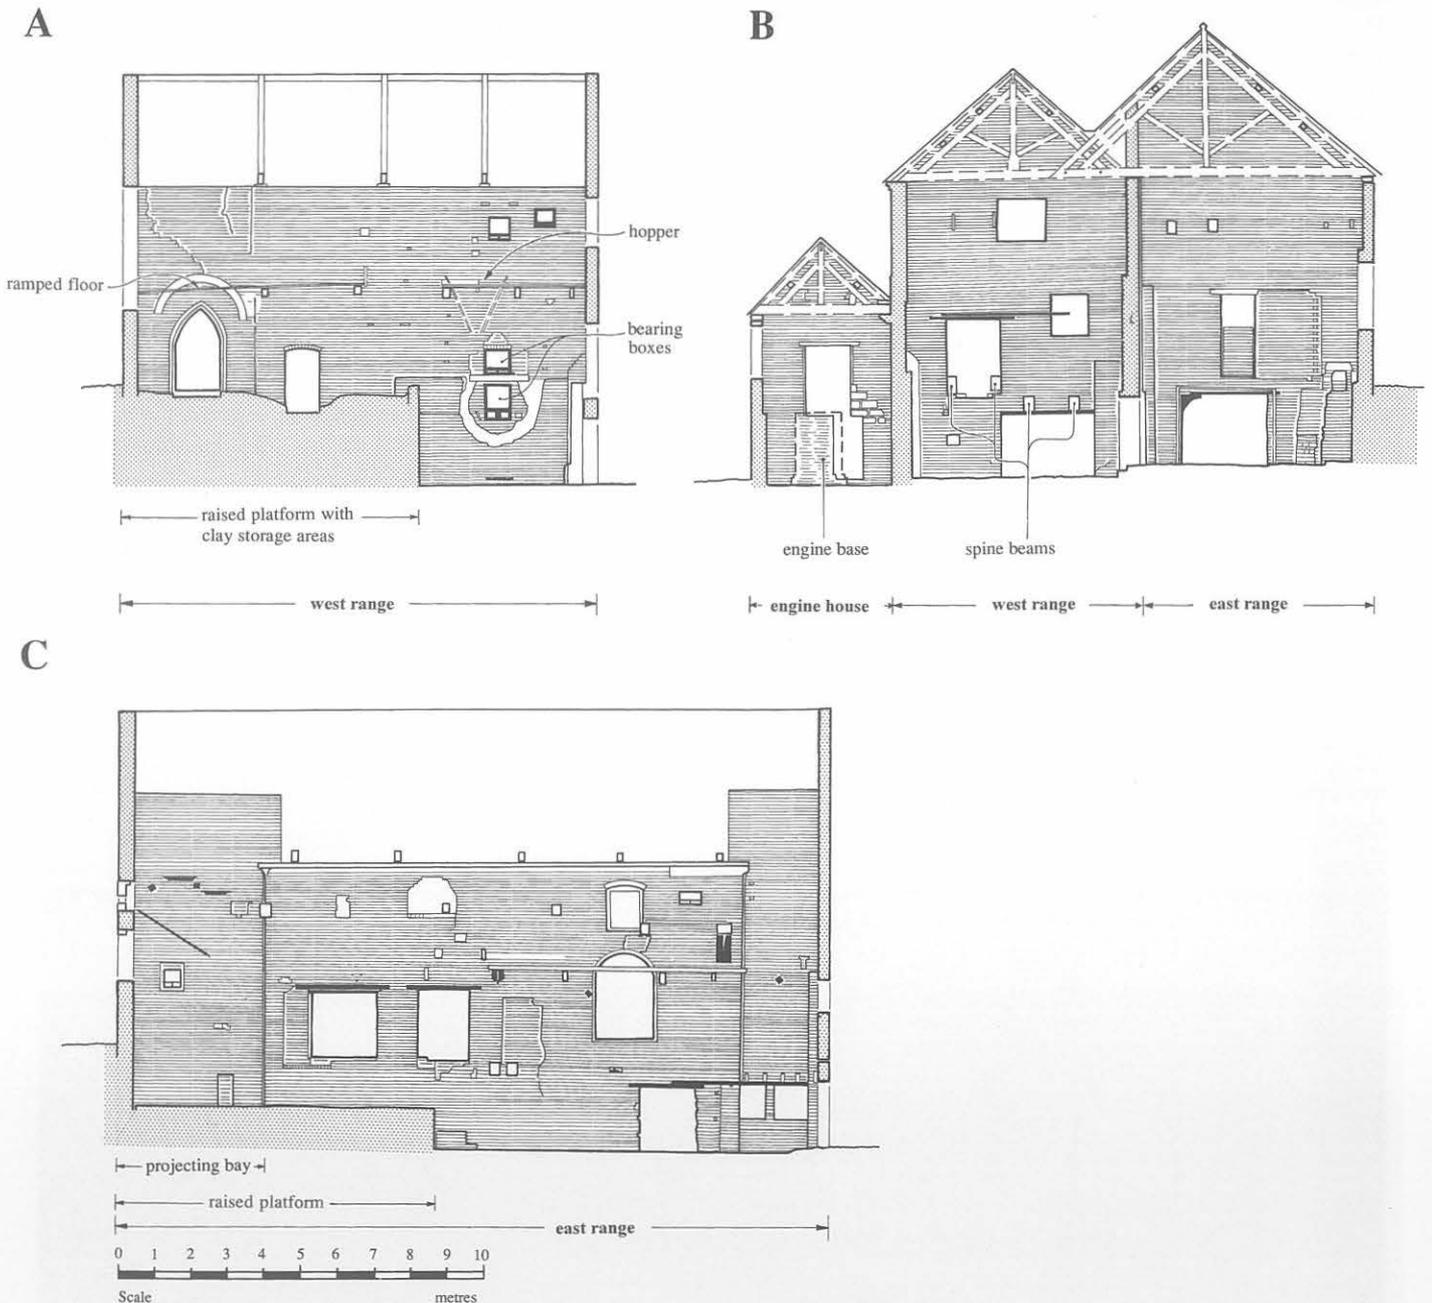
Internal elevations of the clay preparation block. (A) is the west wall of the west range, showing the ramped floor along which the clay was brought before being passed through rollers and then into the hopper. A pan mill was located below, from which the plastic clay was moved onto the raised platform towards the rear. Several bearing boxes are visible towards the north of the wall, behind which is the engine. (B) is the north wall of the block. The flywheel for the horizontal engine was to the right of the engine base. Two of the spine beams in the west range supported a pan mill, whilst a bat machine was in front of the altered ground-floor doorway of the east range. (C) is the west wall of the east range, which is also the former external wall of the west range. The two square-headed openings to the left are contemporary with the east range.
